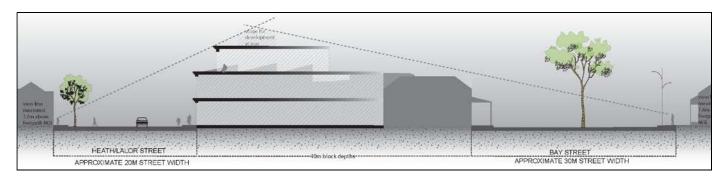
Cross section through Heath / Lalor Street and Bay Street showing potential built form outcome.
